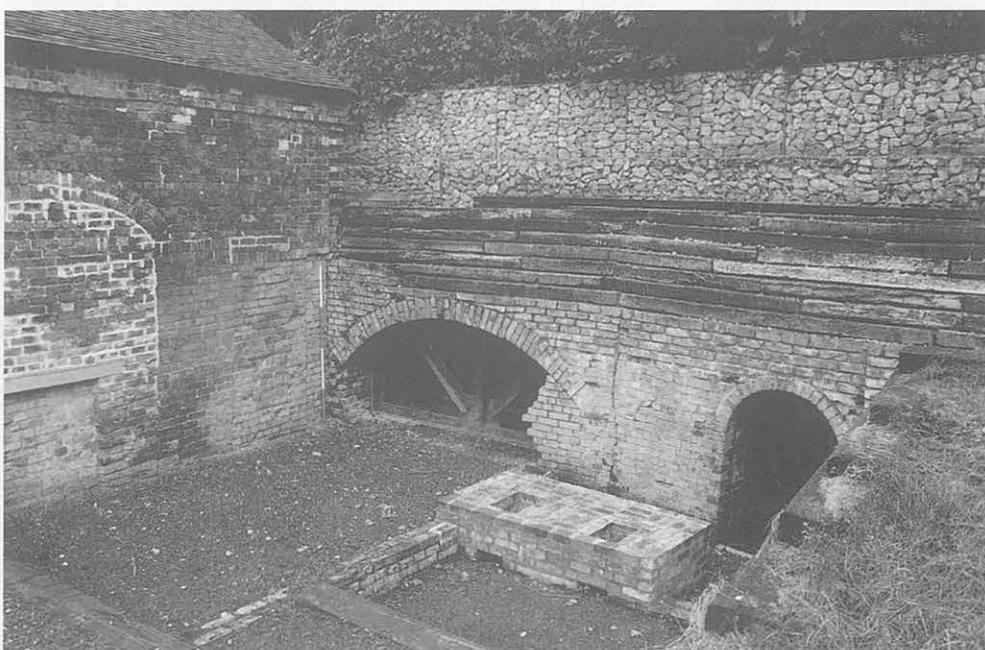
Cellar walls beneath the former laundry, later a tenement, exposed in excavations outside the south wing, photographed looking east in 1998 after the completion of repairs and groundworks. A butt joint clearly separates the two cellar openings. At the upper level, later covered with sleepers, were the foundations of a single-unit dwelling.
